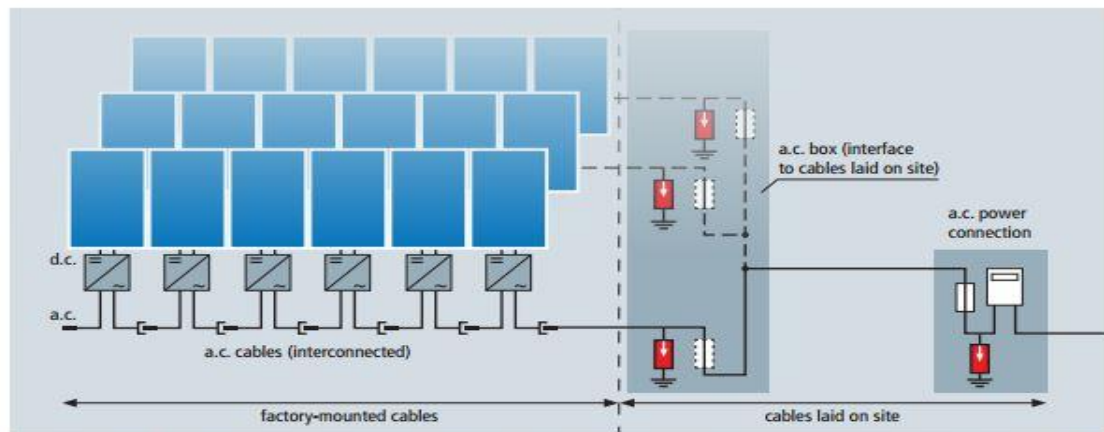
Example: Building without external lightning protection system; surge protection for a microinverter located in the connection box of the on-site cables
